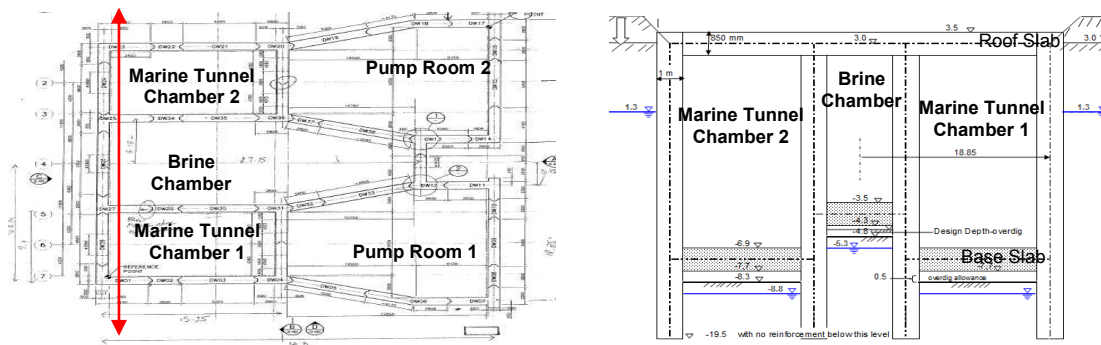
SWIPS diaphragm walls layout (left) and section (right)
